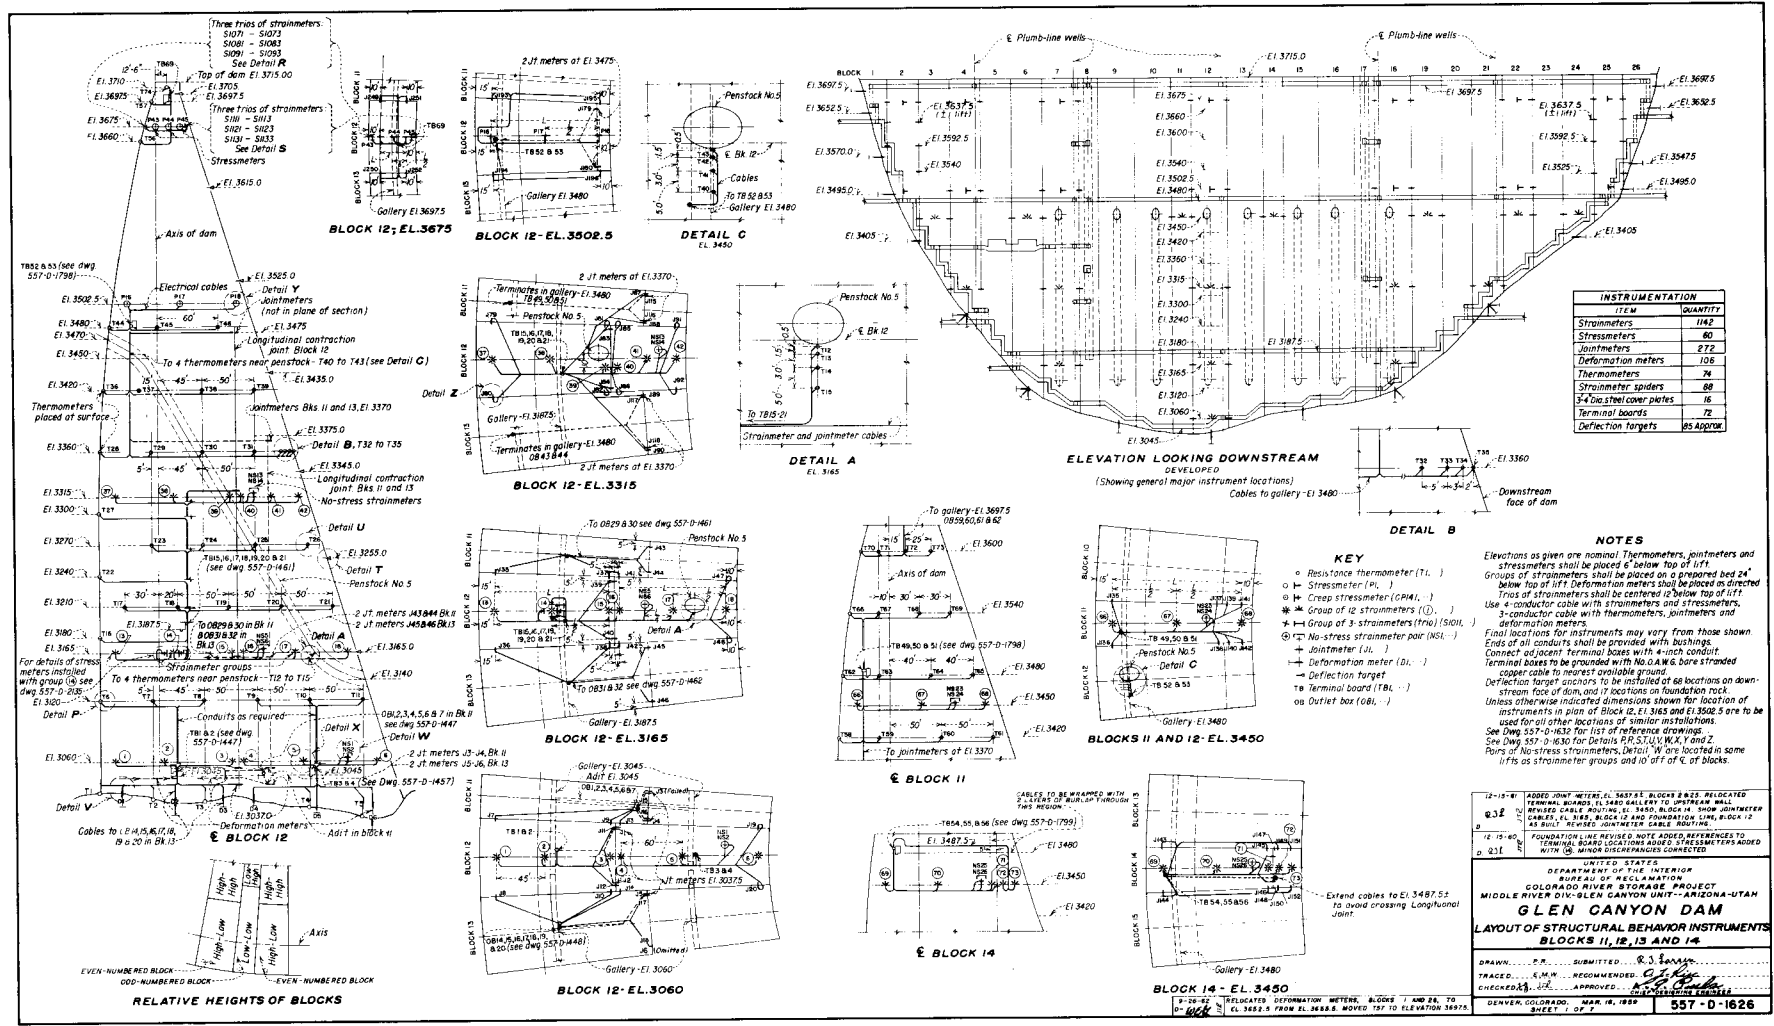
Layout of structural behavior instruments in dam—Blocks 11, 12, 13, and 14.
